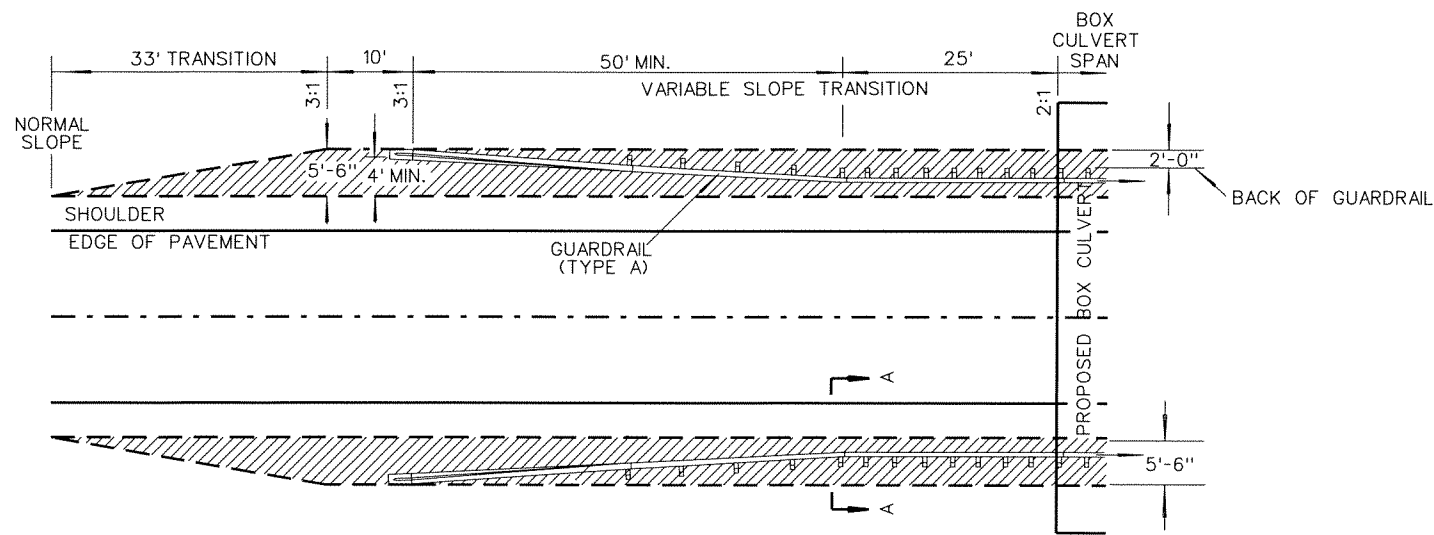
DETAILS SHOWING POSITION OF GUARDRAIL ON ROADWAY
